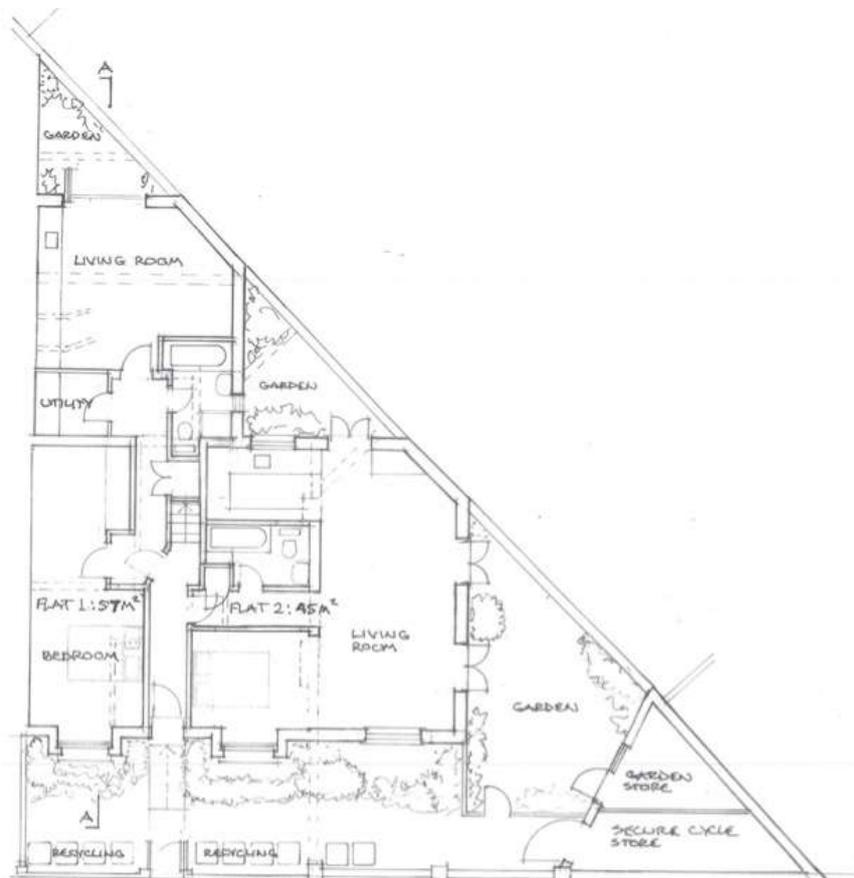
Withdrawn Proposals for 70 Berrymead Gardens – Ground Floor Plan
